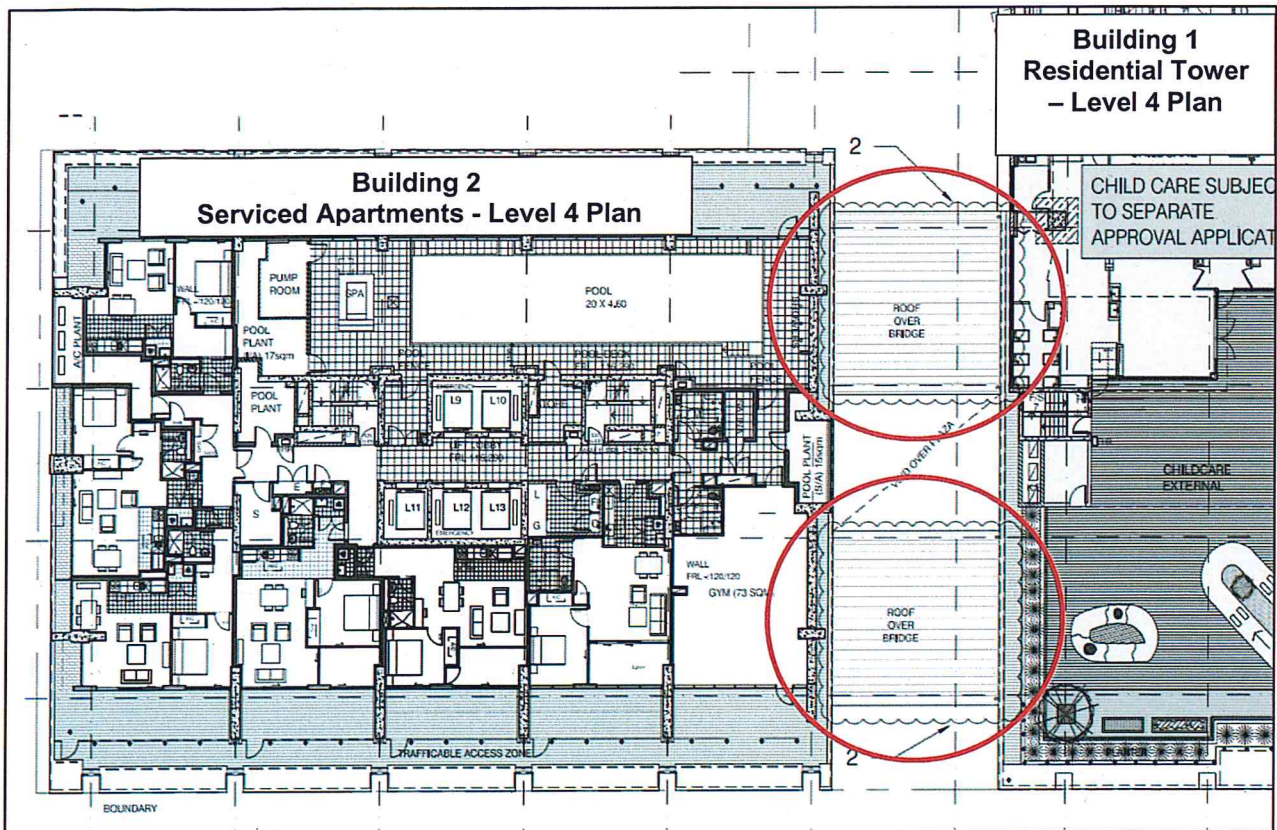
Aerial view of proposed roof over approved bridges between each building at level 4
